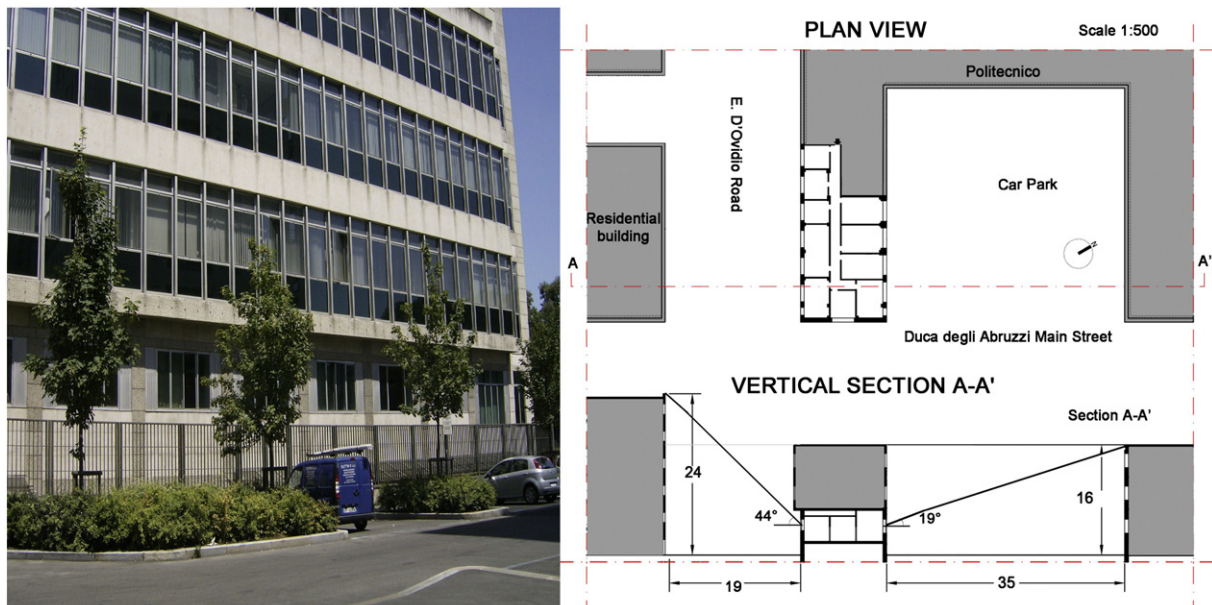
Plan and vertical section of the department and view of the surrounding buildings.
